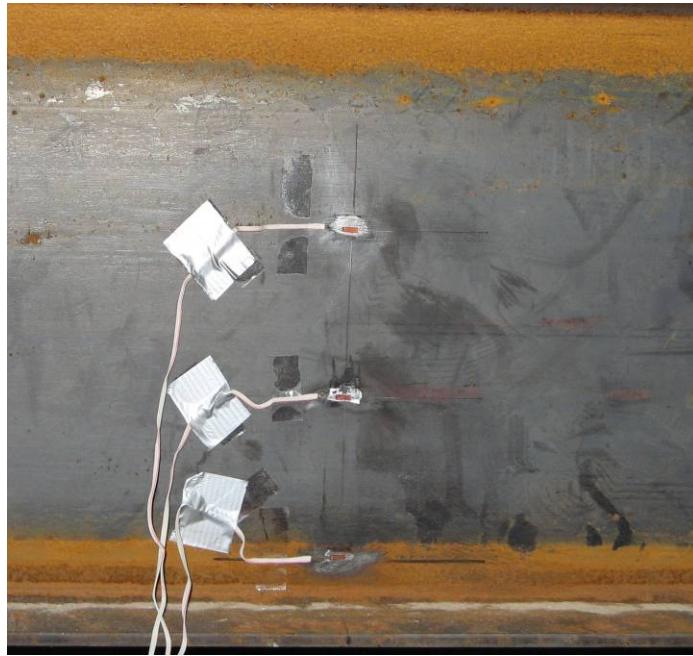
KYOWA KFG-6-120-C1-11L3M3R electronic strain gauges bonded on the girder web of the bridge deck.
